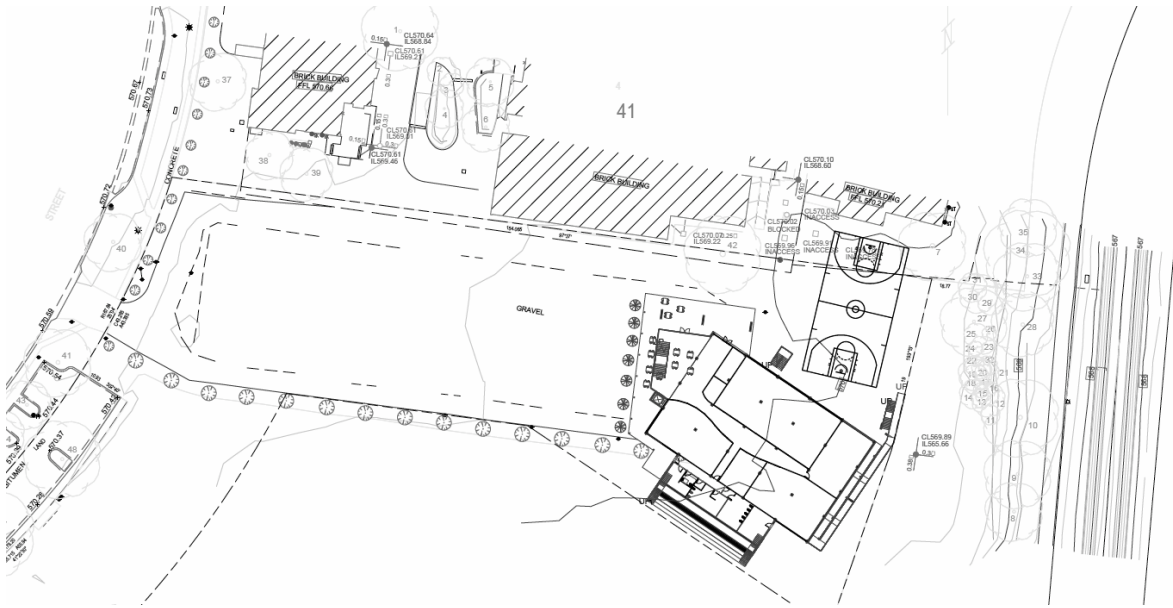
BUILDING SET BACK FROM BRIGALOW STREET
